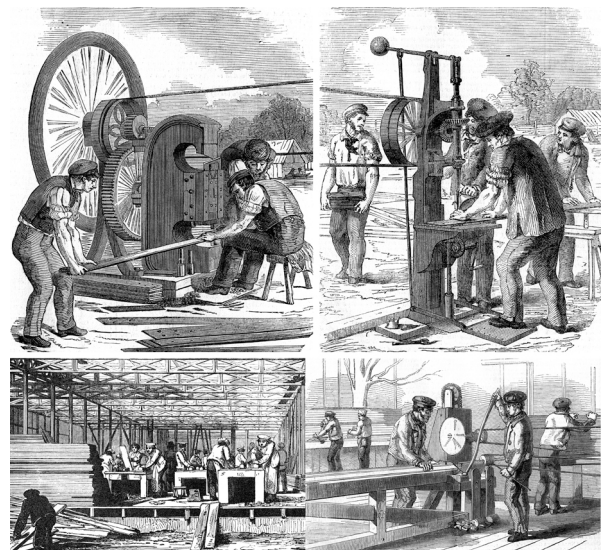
Fabrication on site: Cutting and perforating wrought-iron bar and angle for all trusses over 24 feet span. Carpenter's workshops where the lumber was prepared for use throughout the building. Some steam driven machines were used.
